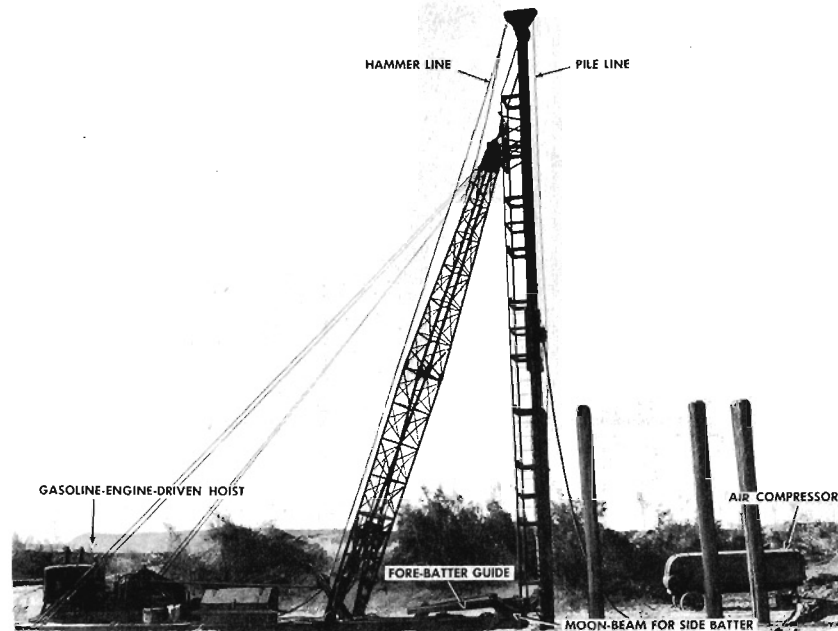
Steel-frame skid-mounted pile driver with swinging leads.
